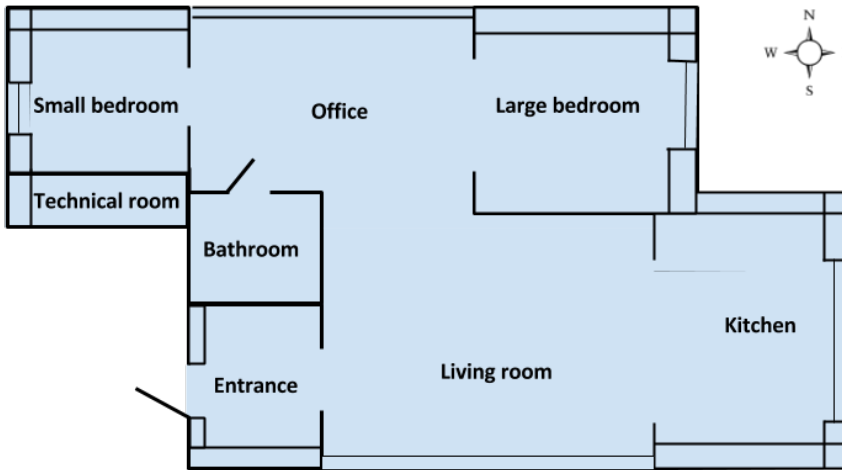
Illustration of the layout of the Living Laboratory facility
